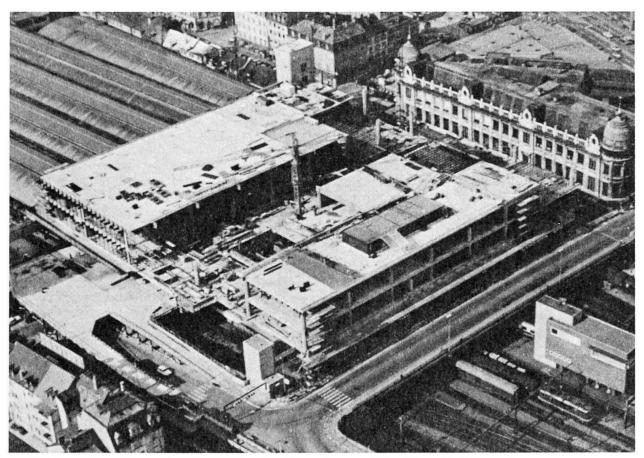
New Postal Building on the railway station Basel is nearing completion. The old building in the rear will be demolished and replaced by an extension to the first new part of the building.
